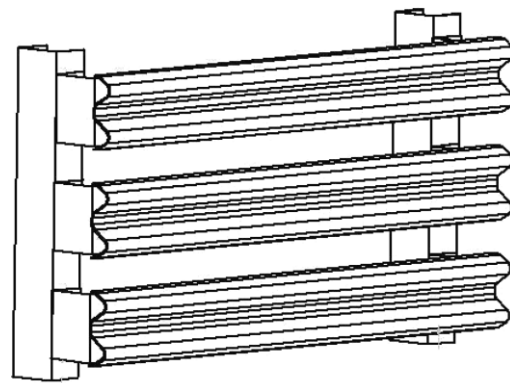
Modified W-Beam Guardrail System for Control Purpose (Reprinted from Tan et al., 2008).
